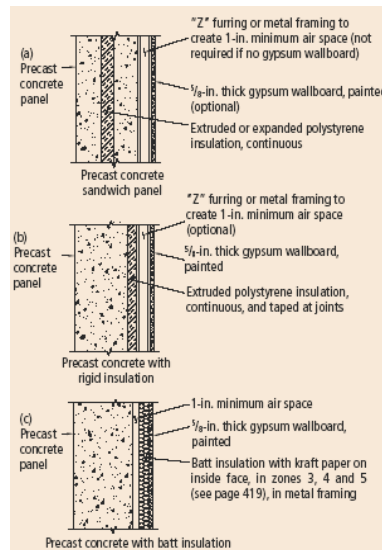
Typical cross-sections of cladding panels (from Precast/Prestressed 2007, by permission).
